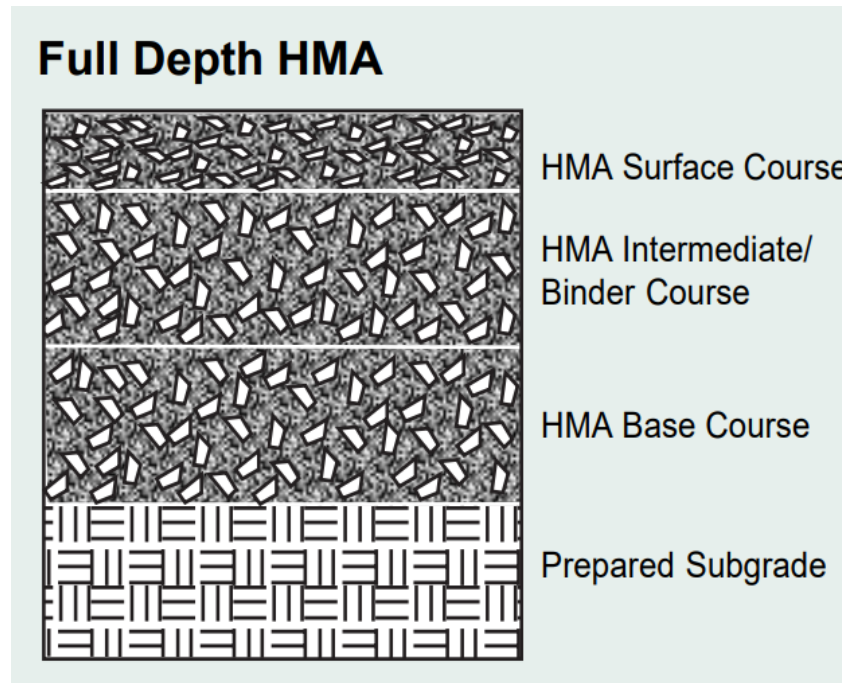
Typical design of a road structure as per FHWA HMA Pavement Mix Type Selection Guide
